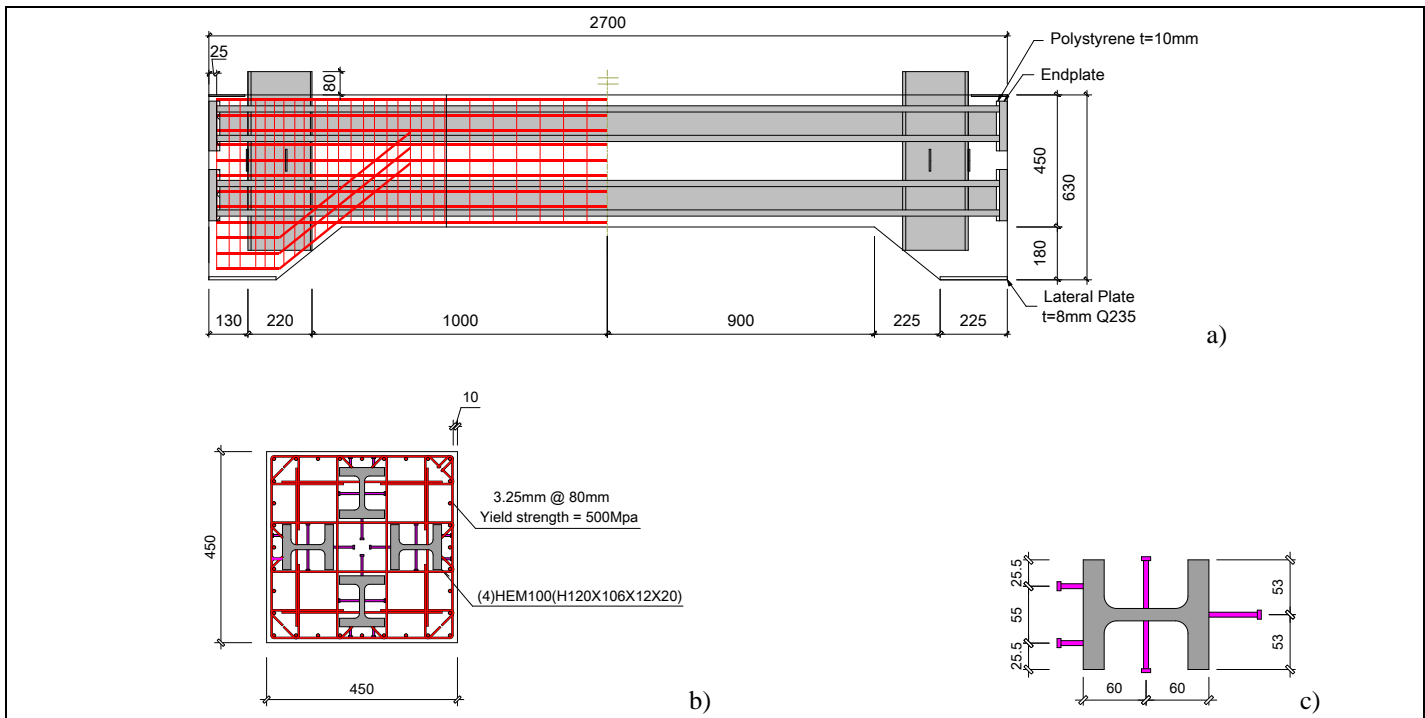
Details of the static tests: a) steel layout – longitudinal view; b) Cross section details; c) Shear studs layout.
